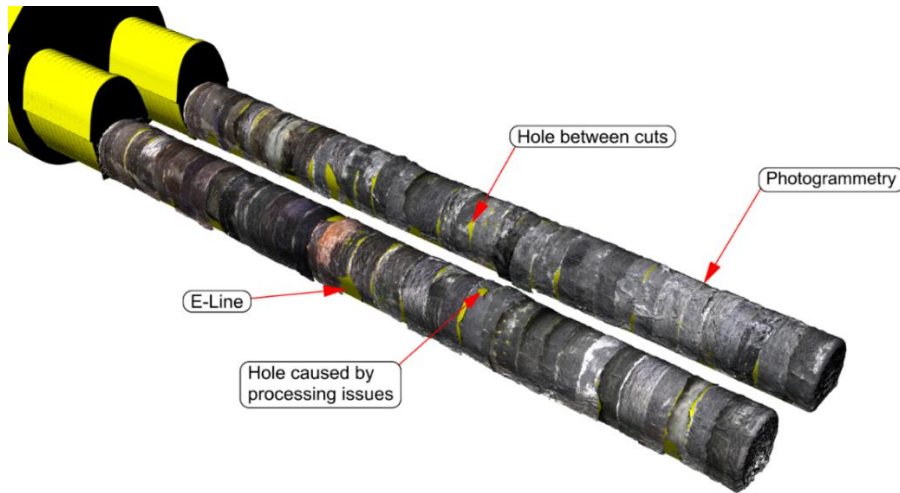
Complete photogrammetric model of the Westmead stub tunnels overlay the E-line used in construction
